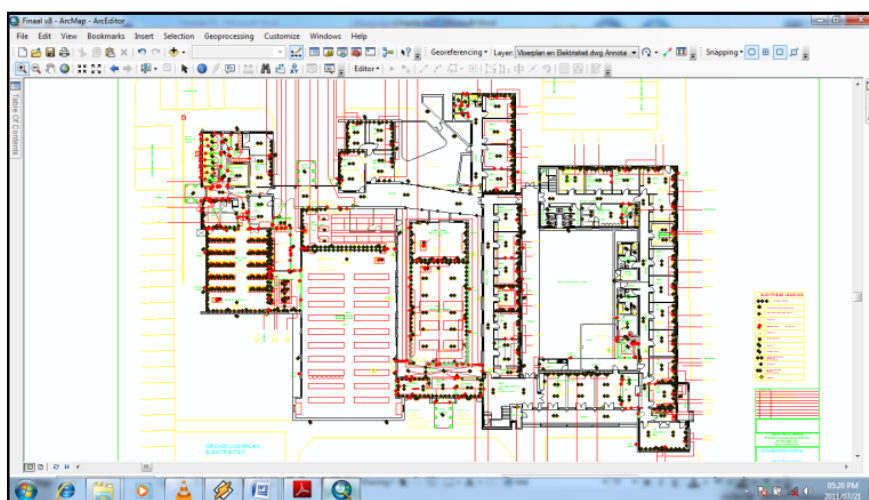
Electrical CAD data for ground floor of building E4 (Department of Technical Services, 2011)
